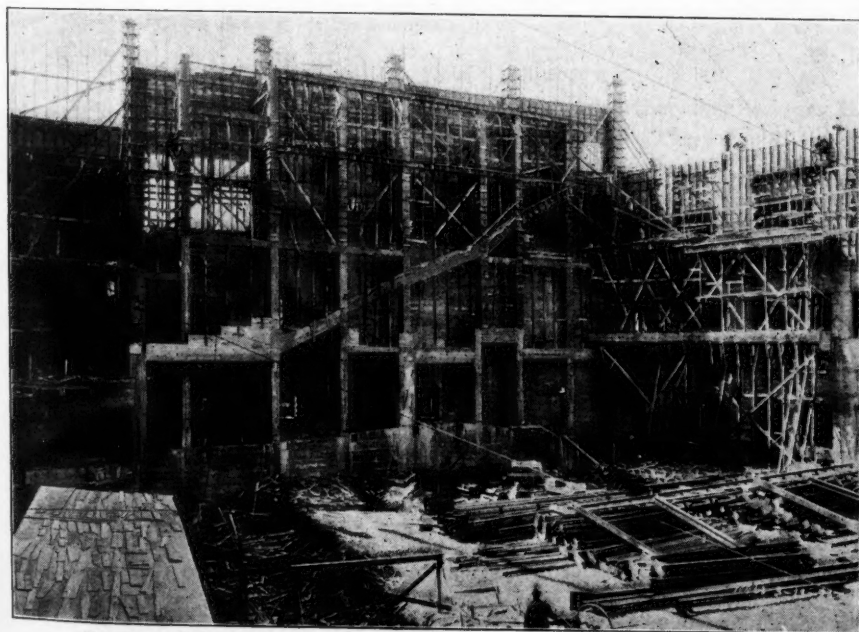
VIEW OF INNER WALL FRAMING AND SOLID EXTERIOR SIDE-WALL, AL MALAIKAH TEMPLE.
